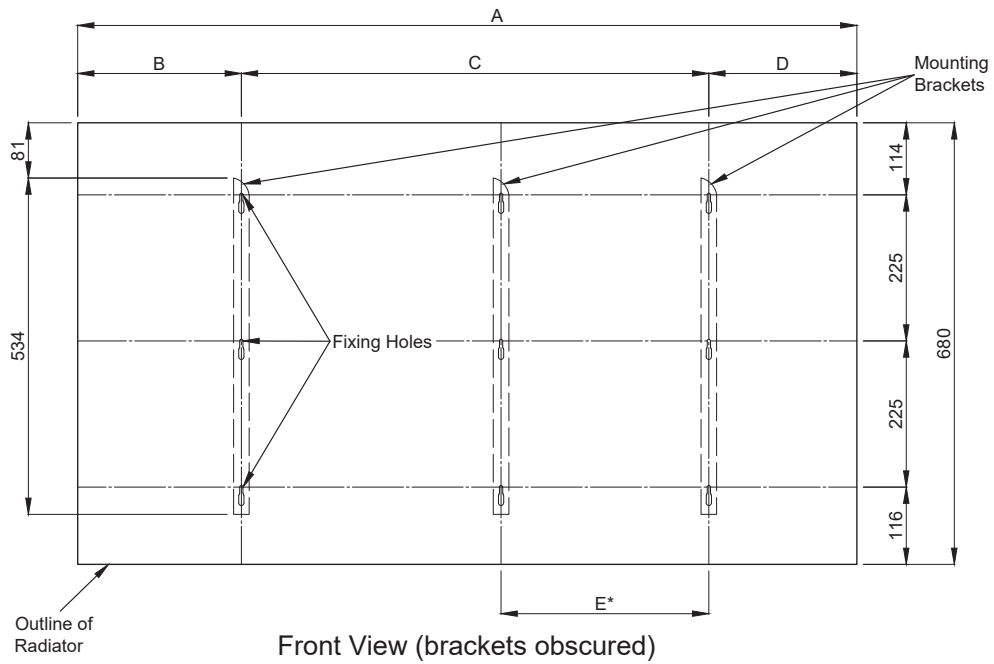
Fixing hole positions for Horizontal 680mm high radiators
